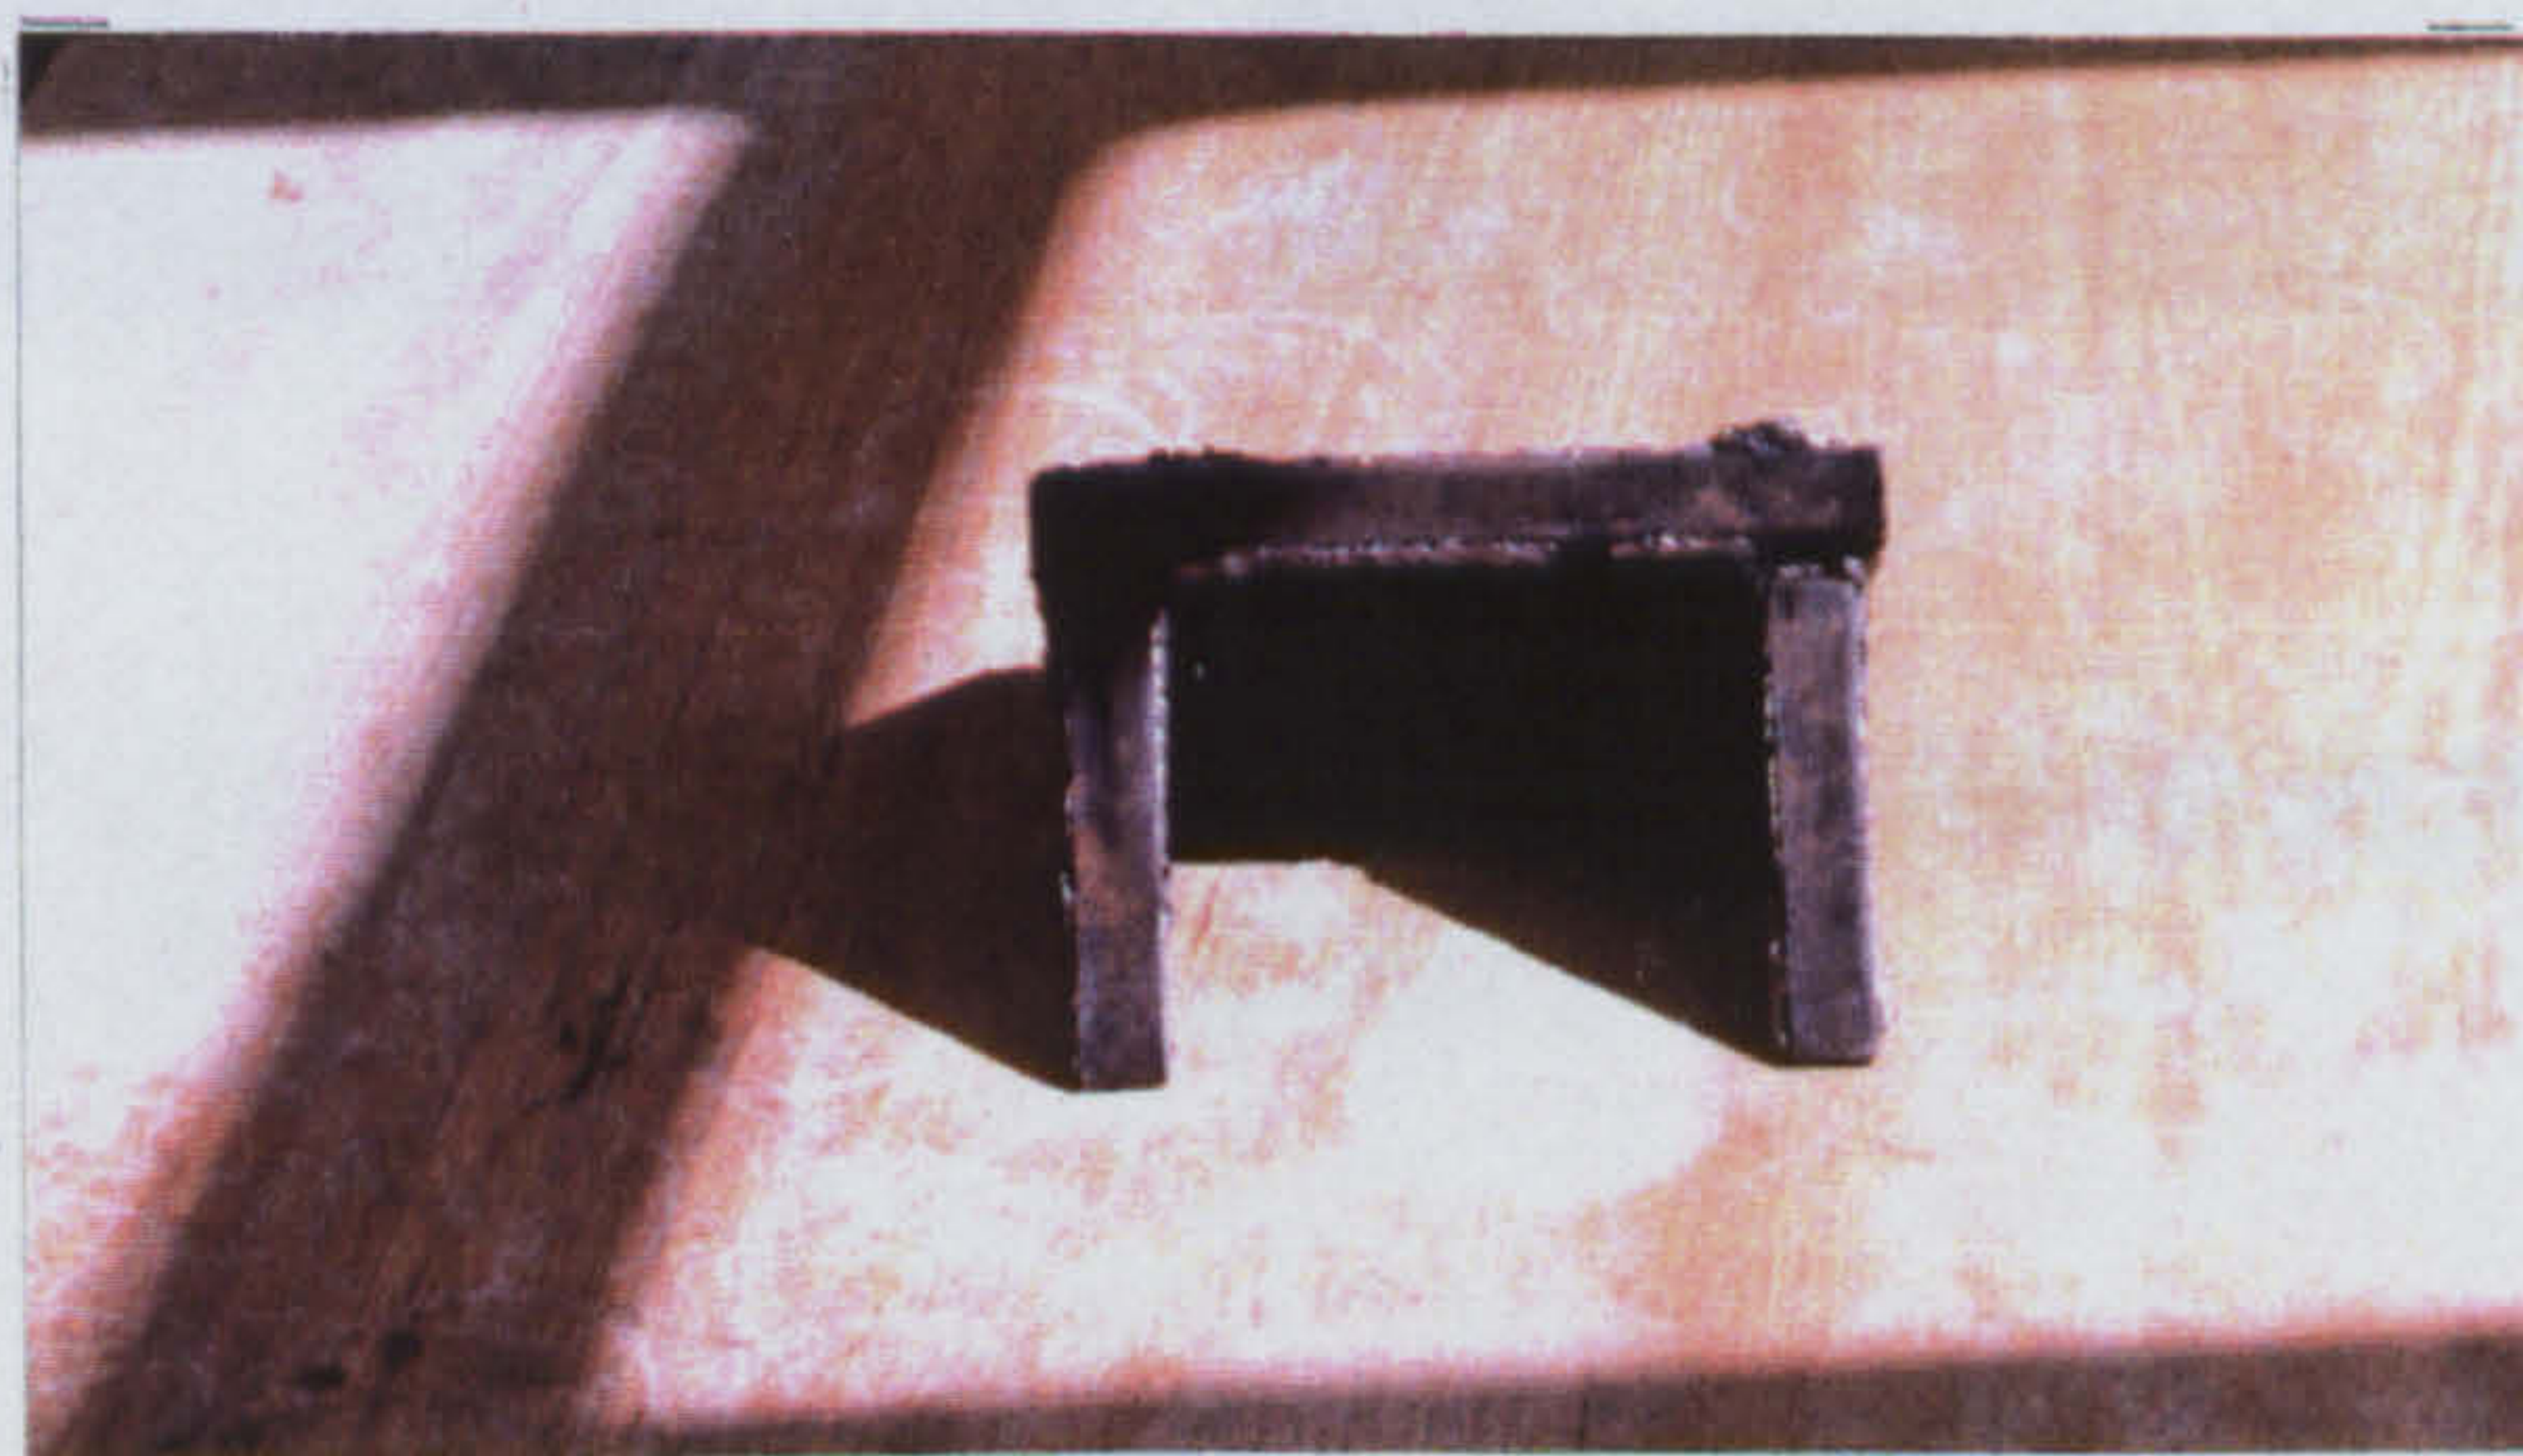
FAILED BRACKET BY WELD FRACTURE REPORTED IN TEST 4.
